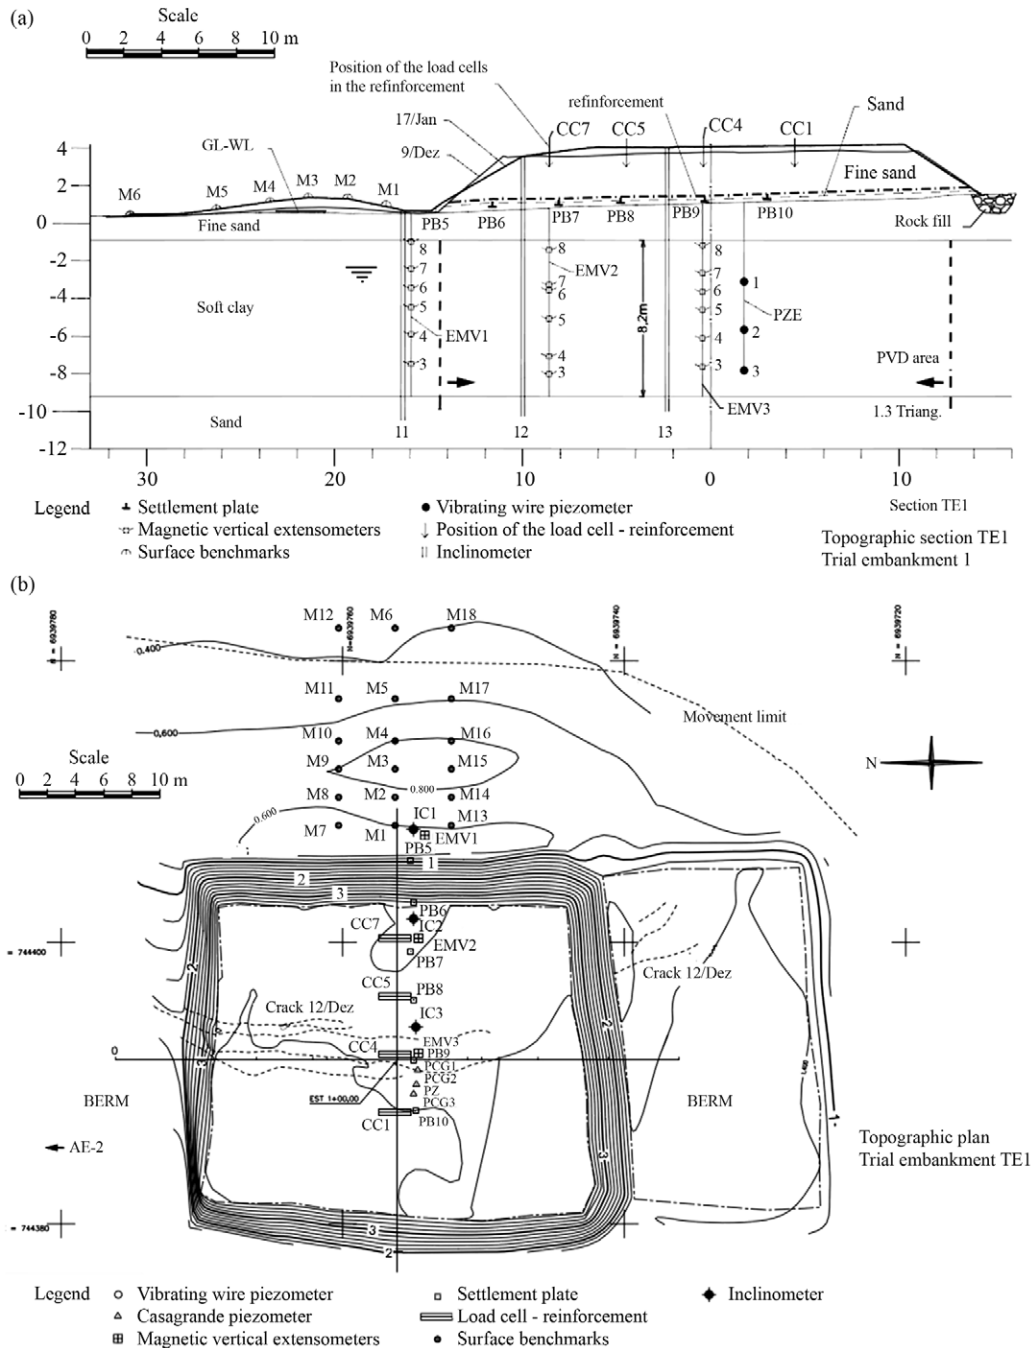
Test embankment TE-1, with drains and reinforcement: (a) cross-section; (b) plan view.
